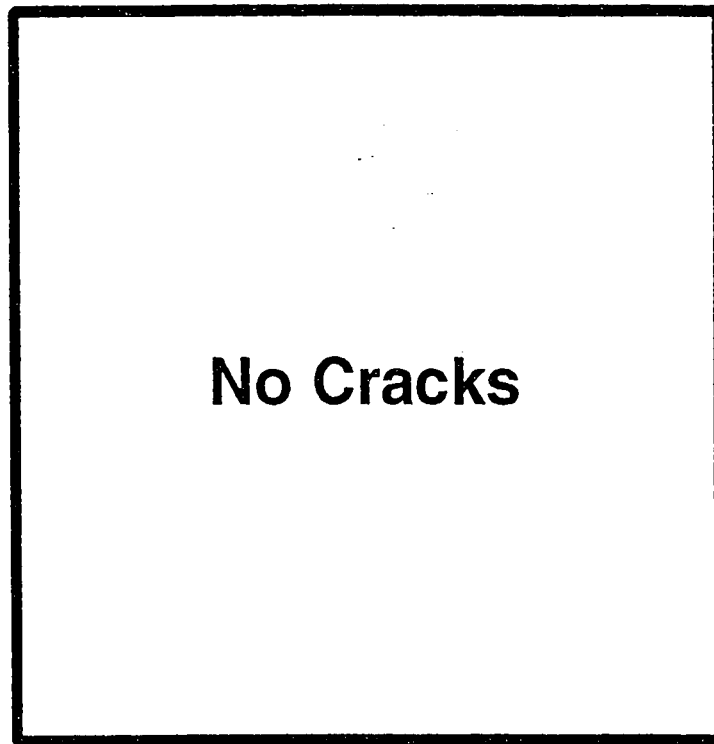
Typical Plastic Shrinkage Cracks in the Concrete Specimens Exposed to a RH of 50 % and Temperature of 25 °C
